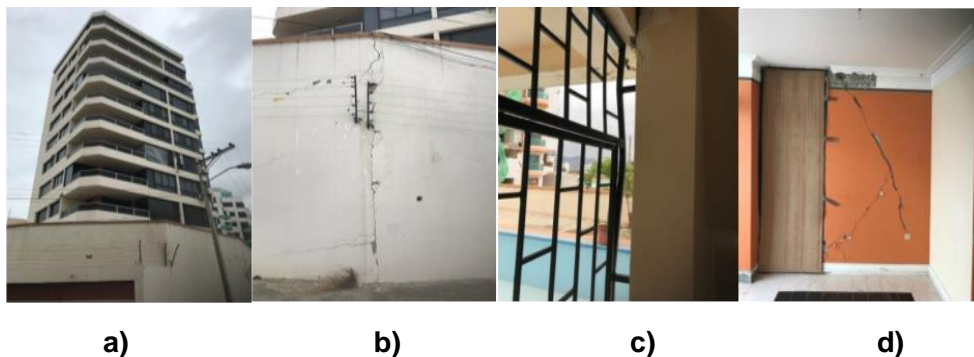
(a) The Horizonte Building of 10 floors of reinforced concrete; (b) The wall of containment presents a vertical fissure; (c) The perimetrales flounces suffered accession and product of this observes bulge in the door of access to the area of swimming pool; (d) Minor damages in internal masonry and broken windows.
